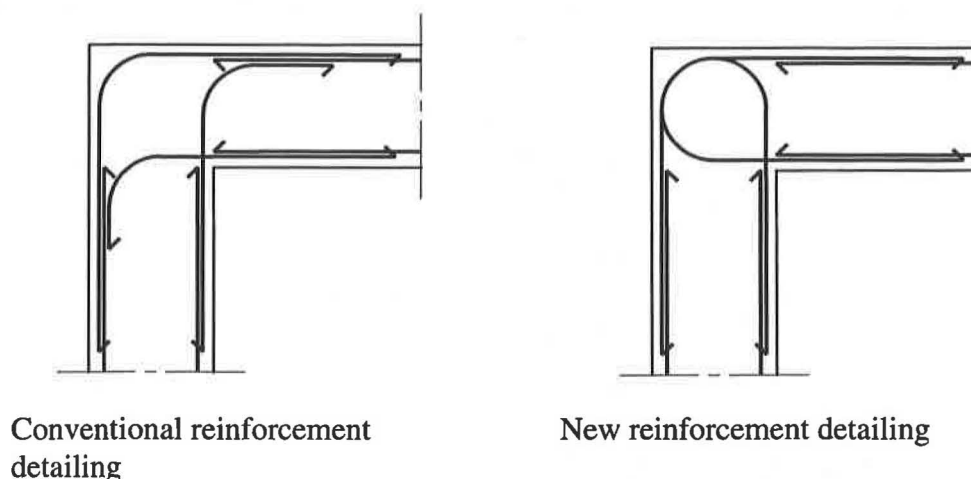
Conventional and new reinforcement detailing in frame corners.
